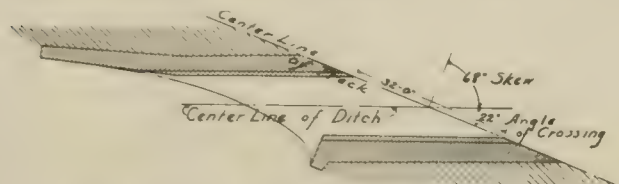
LAYOUT OF 12-FT. ARCH ON 68 DEGREE SKEW.
